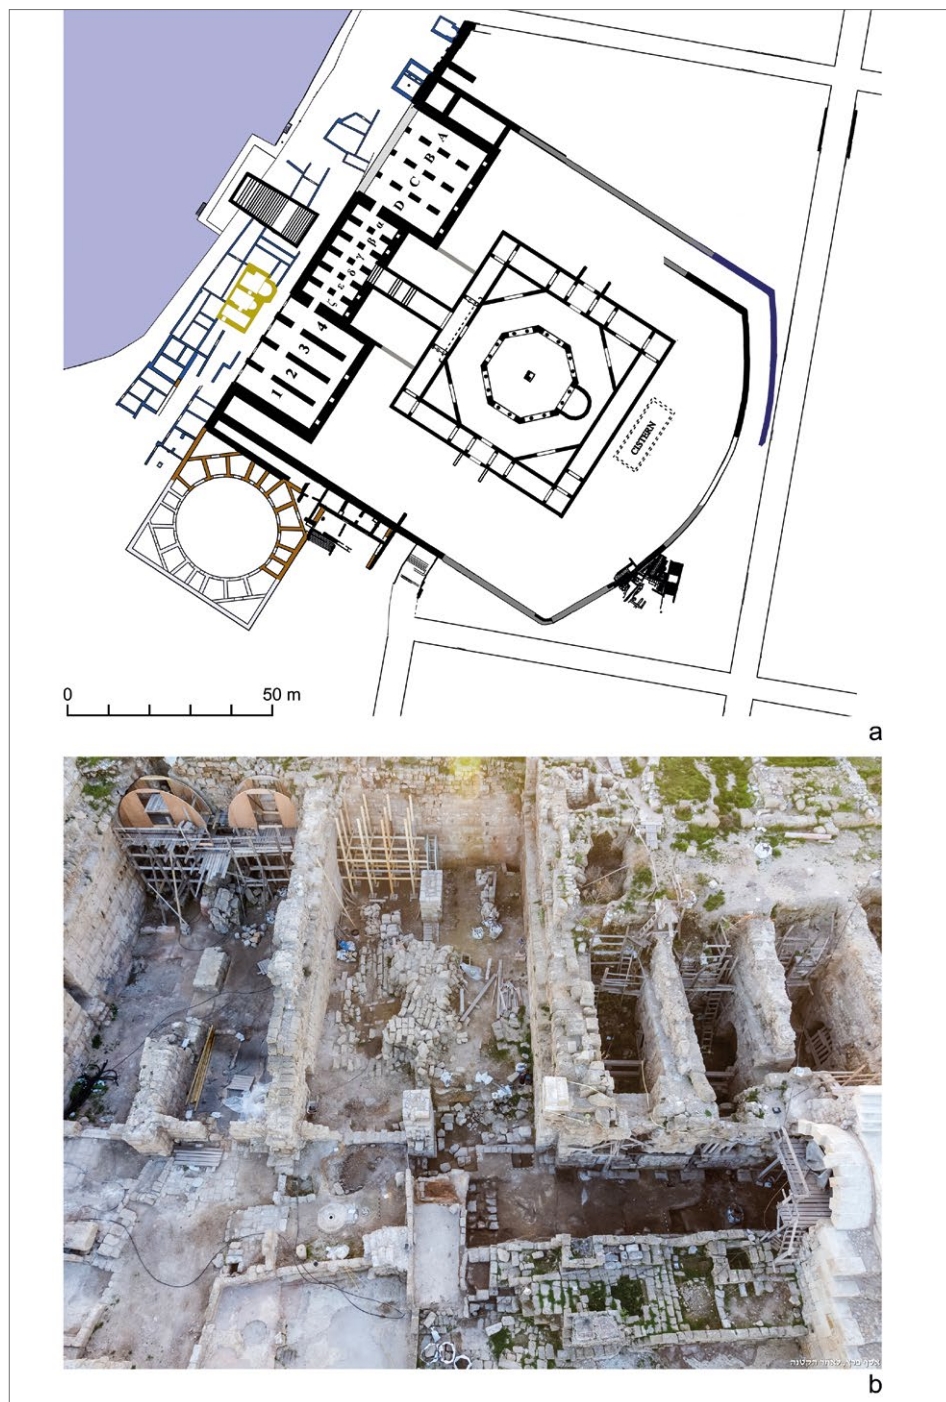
Octagonal Church Complex: a – ground plan (Drawing A. Iamim and P. Gendelman); b – aerial view of the western façade vaults (IAA | photo A. Peretz)
